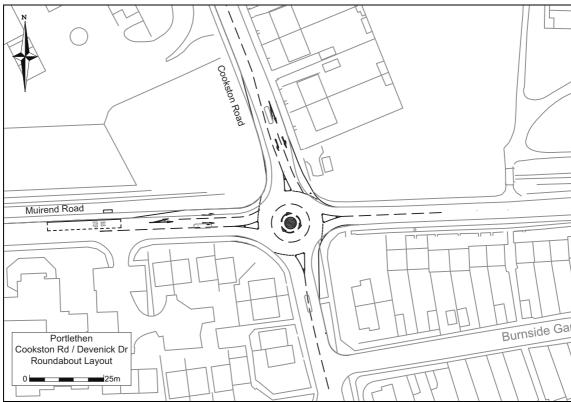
Cookston Road/Muirend Road Roundabout Design
